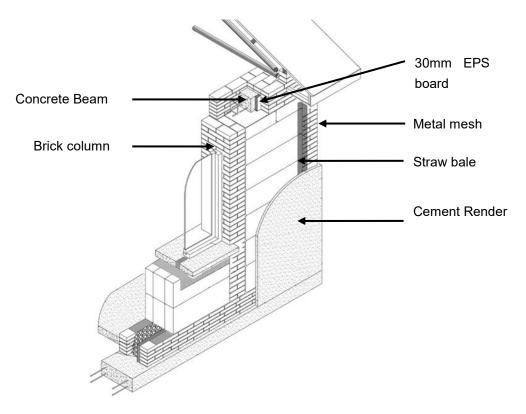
Construction detailing of ADRA straw bale buildings. (29)
